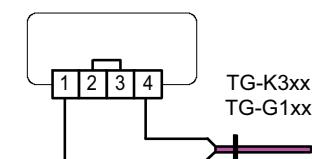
Wiring of floor or duct sensor when using internal setpoint
